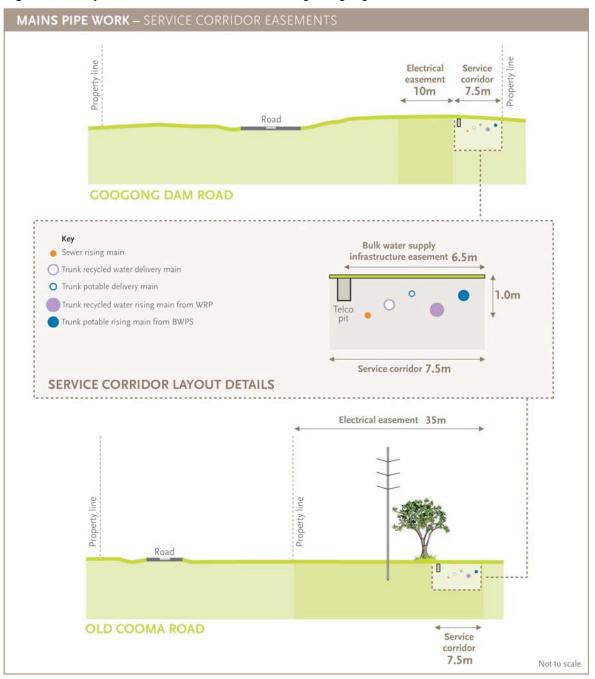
Layout of the easement corridors along Googong Dam Road and Old Cooma Road
